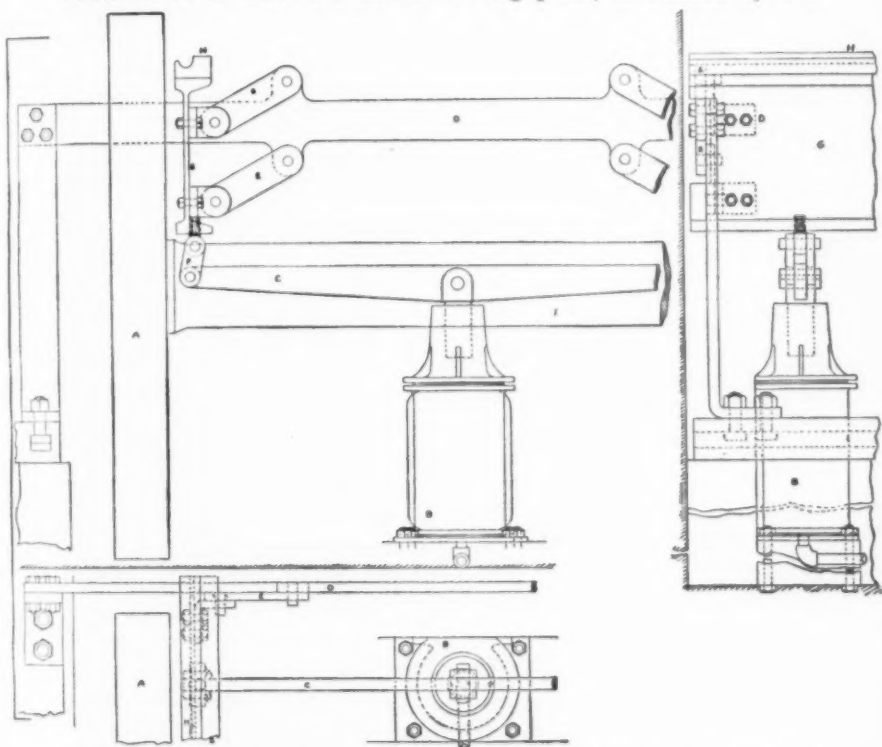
REMOVABLE TRACK, ENGINE TESTING PLANT, C. & N. W. RY.
